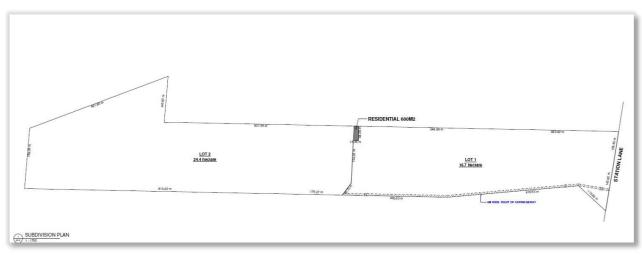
Plan of Subdivision (Prepared by UPG Pty Ltd)
